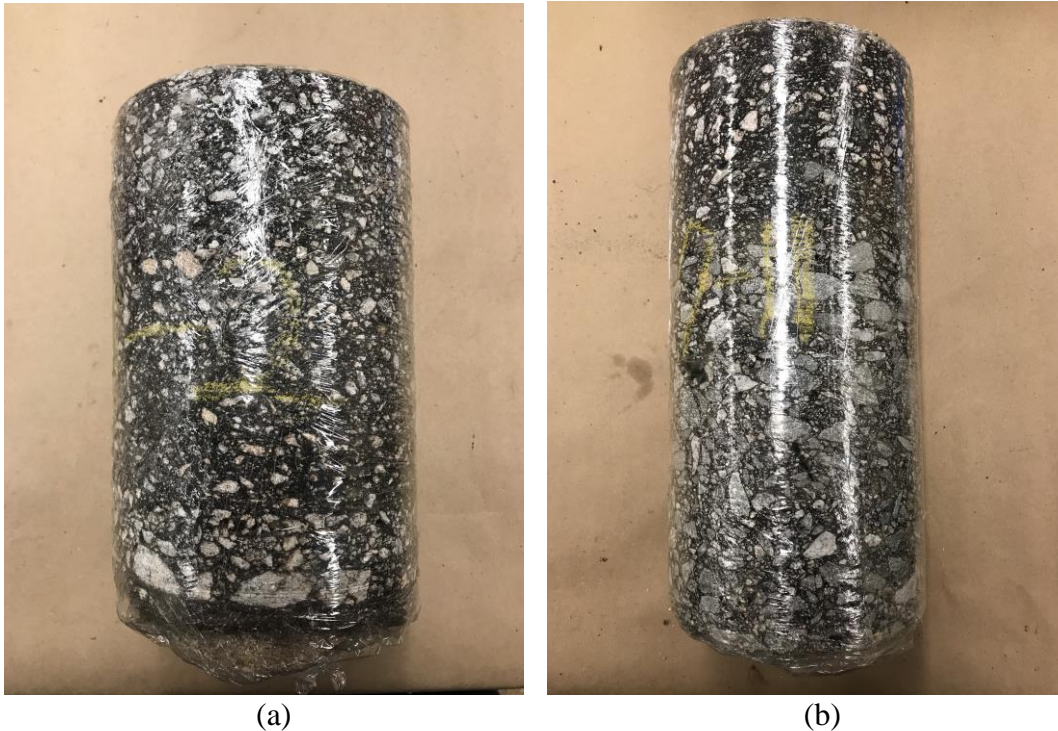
Field cores obtained from two NC 96 test structures: (a) field core extracted from pavement Structure 1 and (b) field core extracted from pavement Structure 2.
